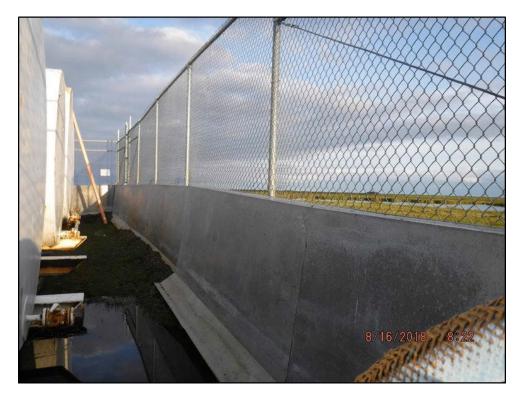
Looking west at Tank #19. Note condition of LKSD tank and containment.
